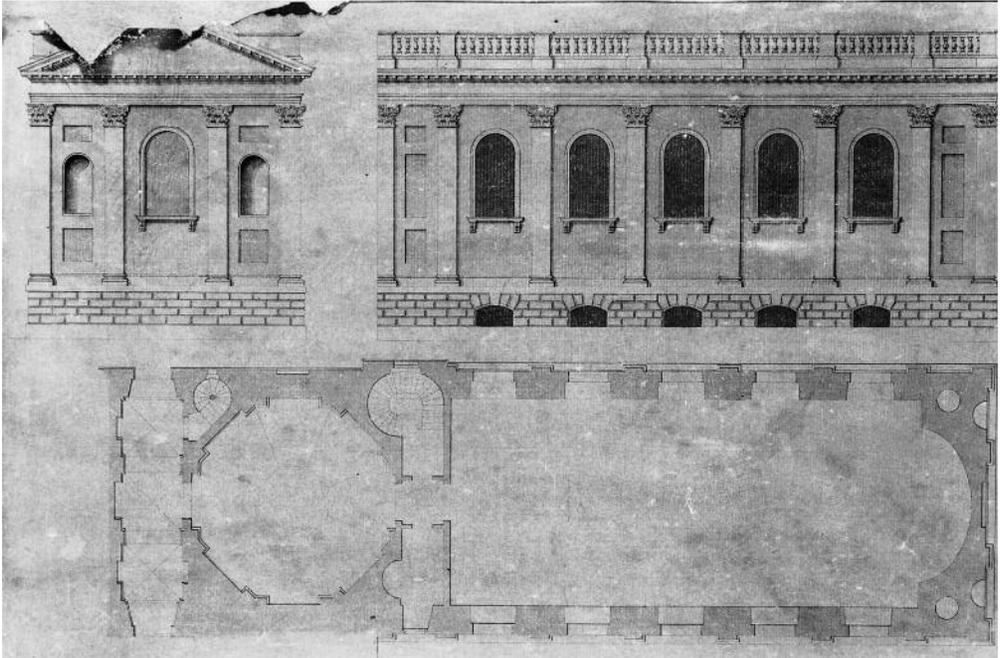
James Essex, east and south elevations, and plan of Clare College Chapel, Cambridge, as executed. *British Library*.
